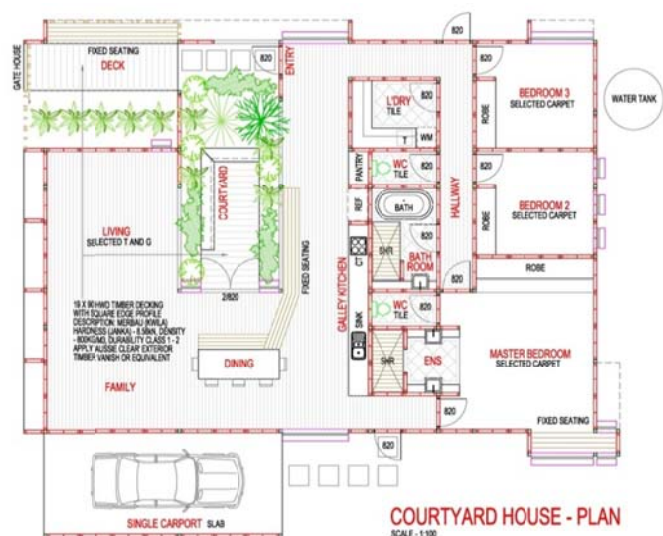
Bleuscape Design – Courtyard House Plan
